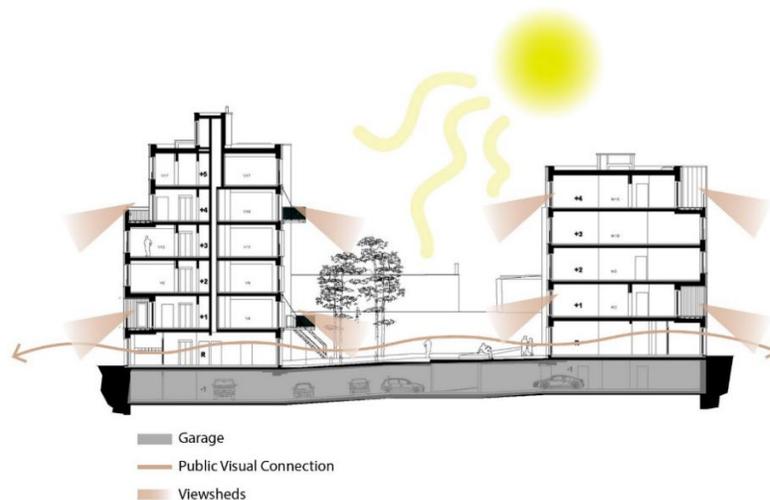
Brutopia Section (Source: ArchDaily & Author)
